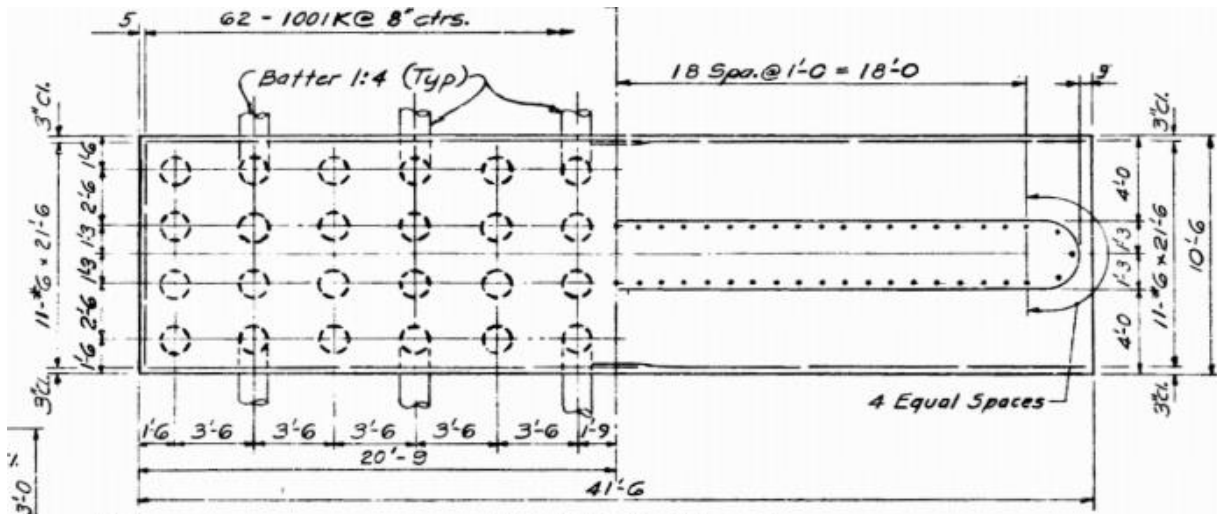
System B: Cross Section of Typical Interior Pier of the Bridge (NBI 33240)
